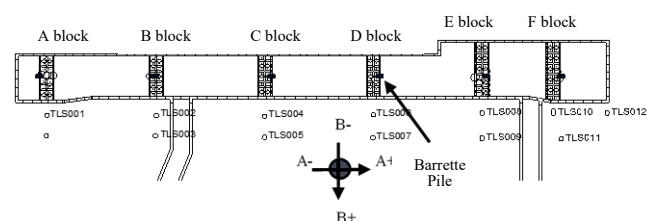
Layout plan of preceding beams and instrumentation plan at OR15 station
